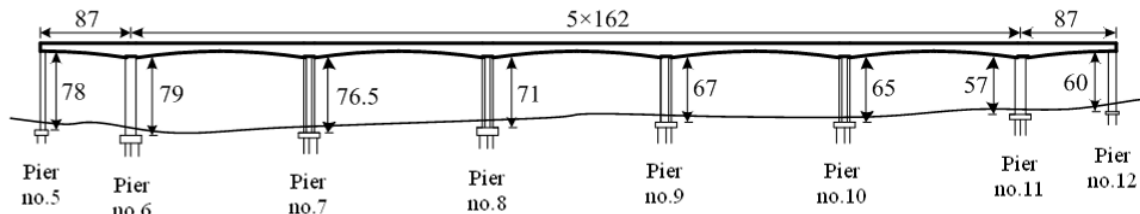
Main spans of Jinghe Bridge (dimensions in m)
